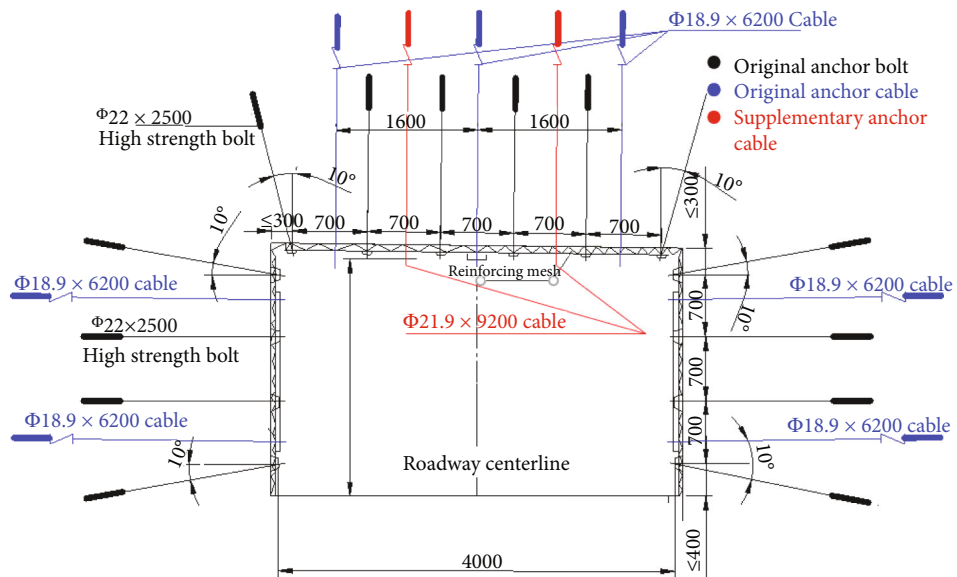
Layout of anchor cables for the reinforcement roof in the headentry.
